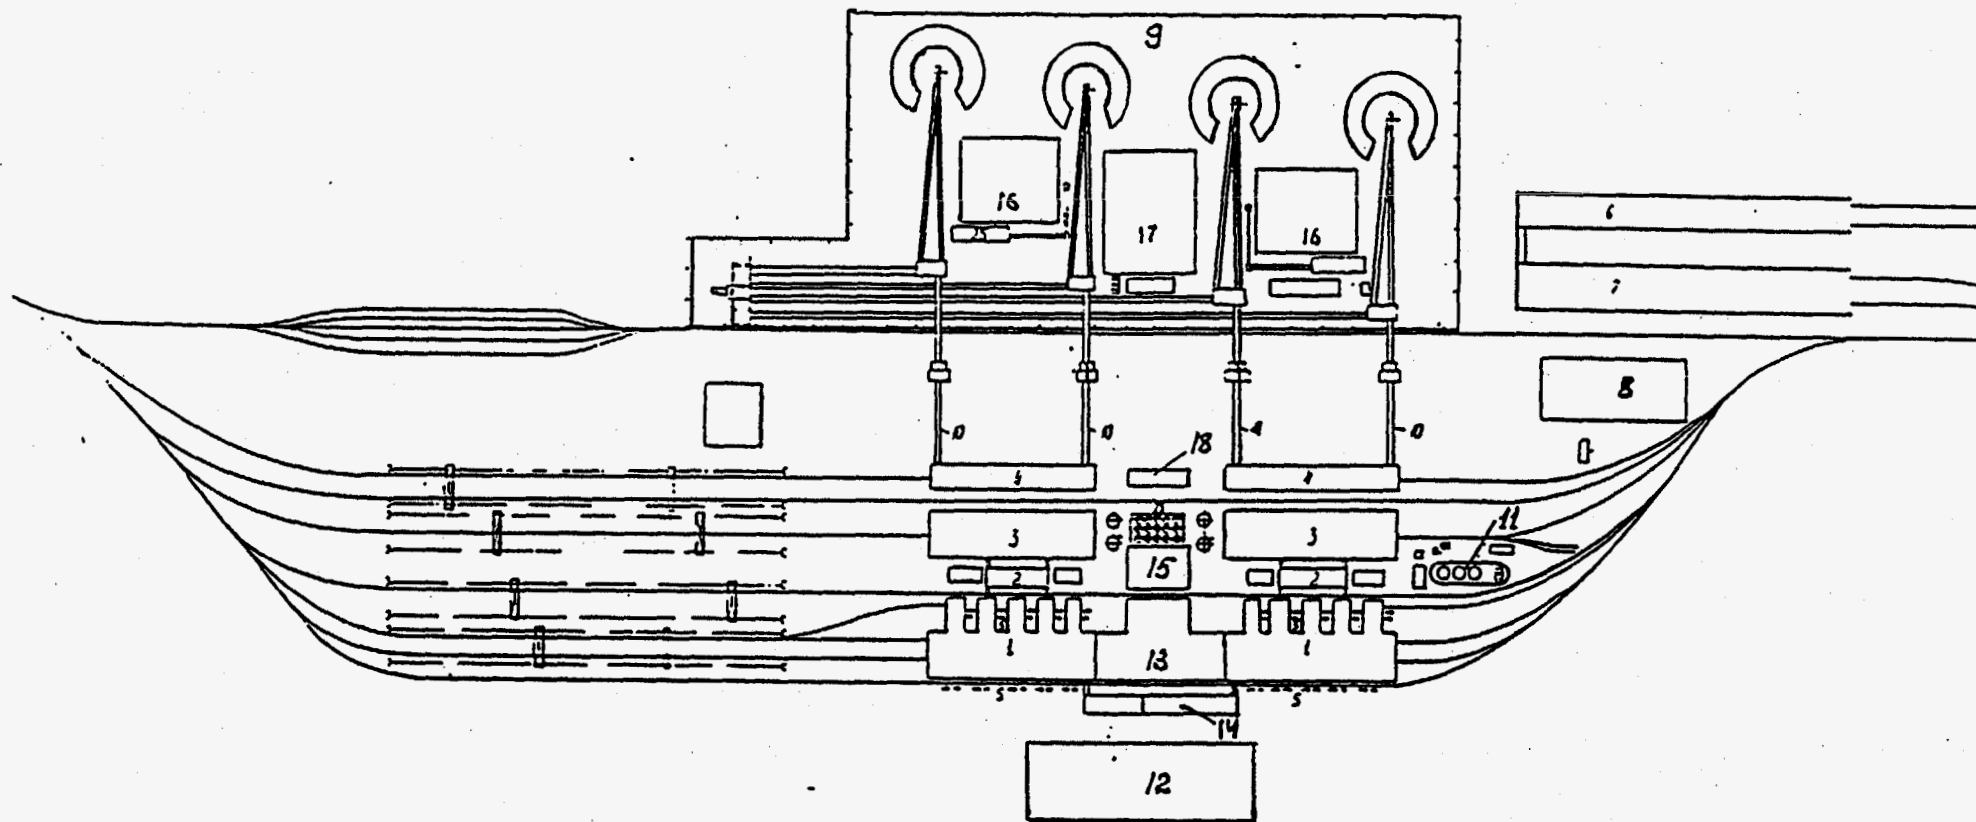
The Layout of TPS with 10 IGCC 600 MW Units
